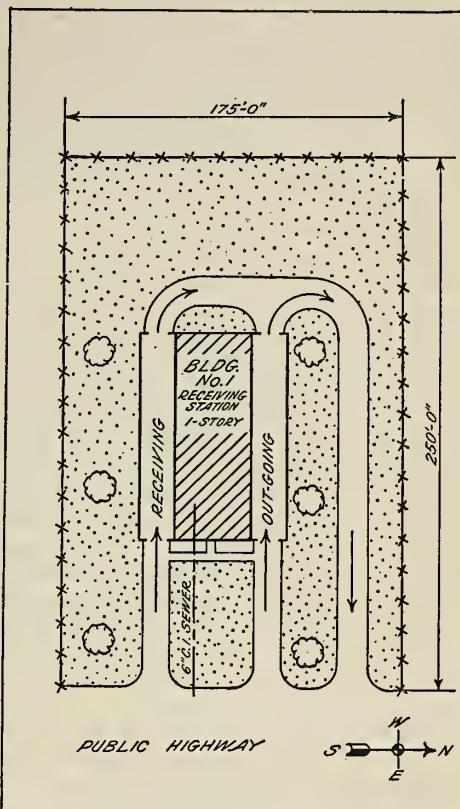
Plot plan of country stations nos. 4 and 5 of the proposed unified system.
